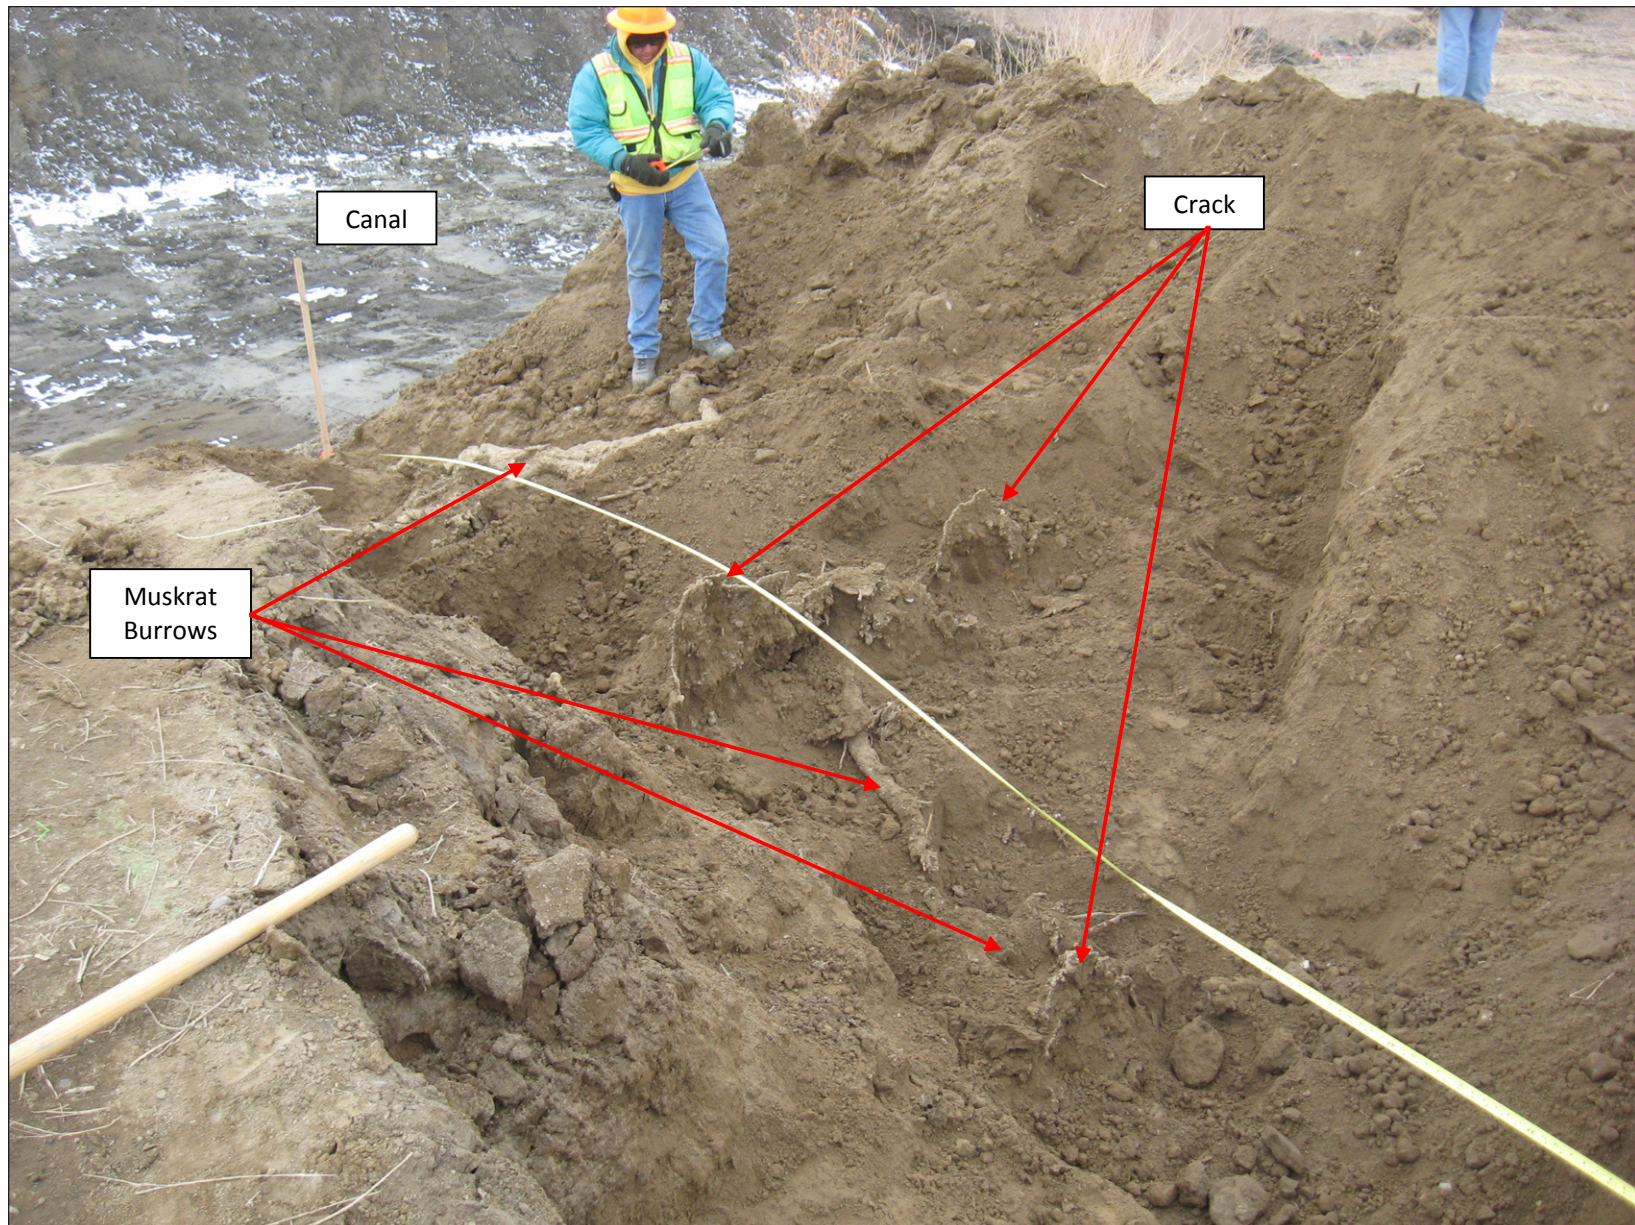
View towards canal showing muskrat burrows and cracks between canal and abandoned gas pipeline, 23 feet from canal.
